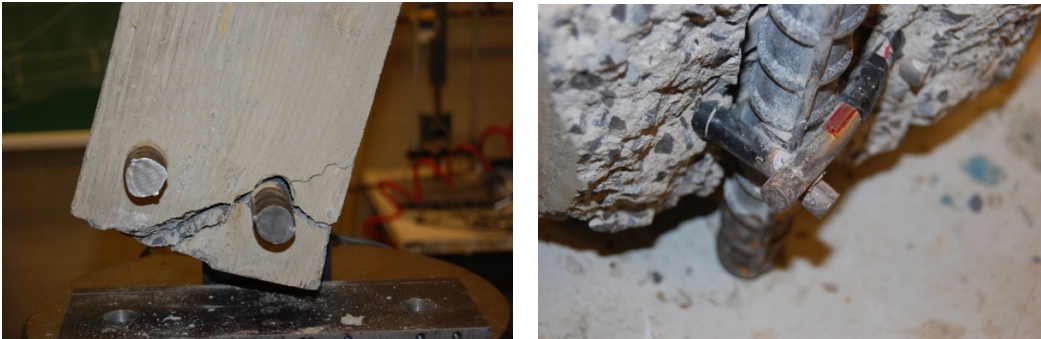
Typical Failed Concrete Cube Specimen under Burst Test Loading
